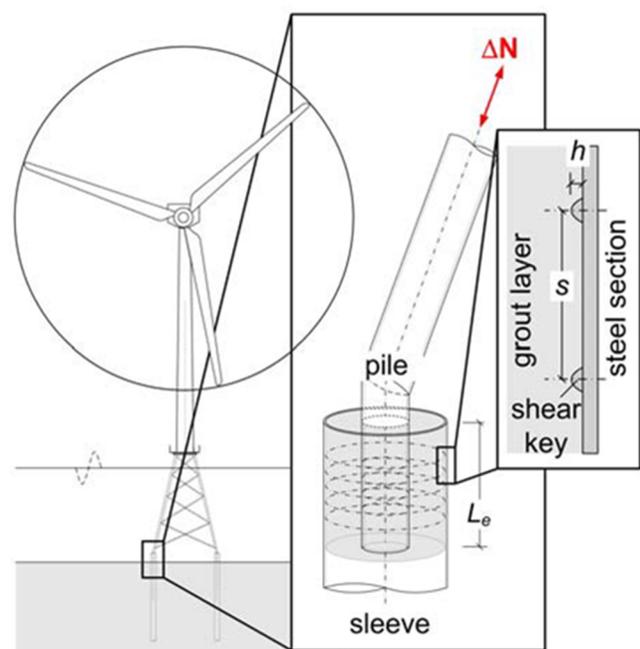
OWT with jacket substructure and detail of the grouted joint (Schaumann, Bechtel and Lochte-Holtgreven, 2010)
